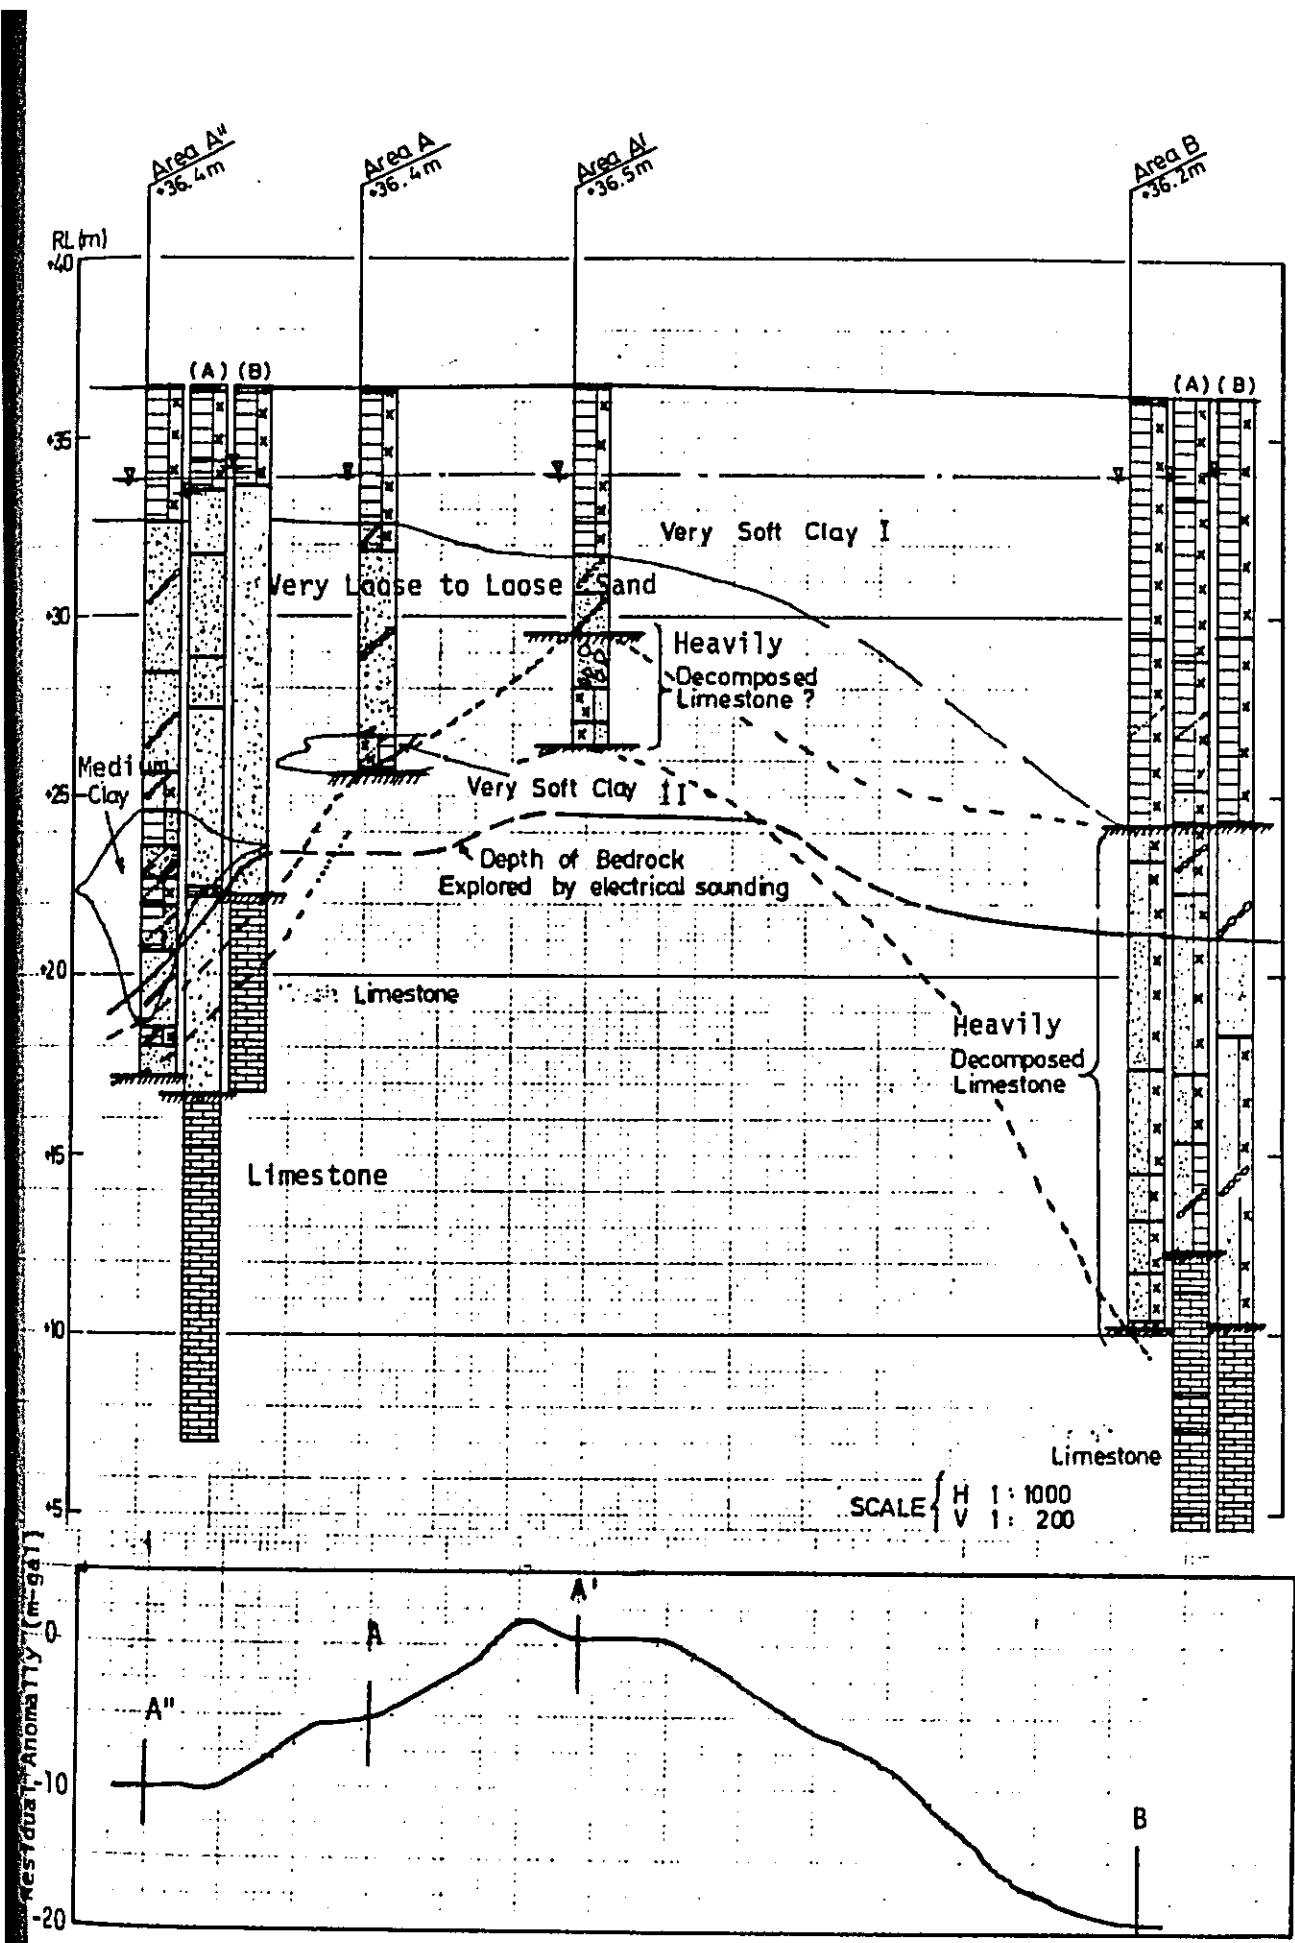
Soil Profile, Cross Section at Pilot Test Area
